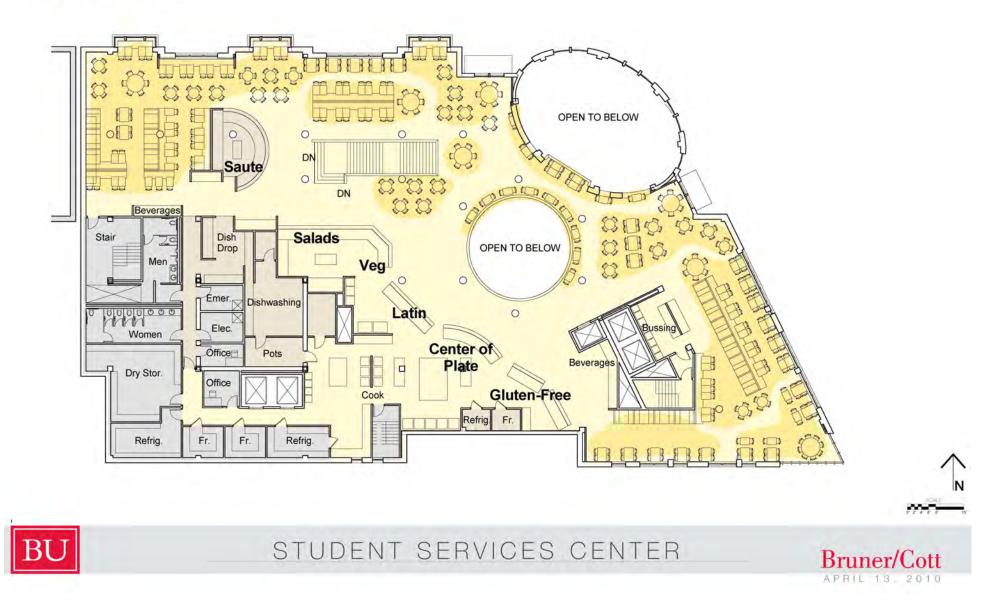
Ground Floor Plan source: Bruner/Cott & Associates
